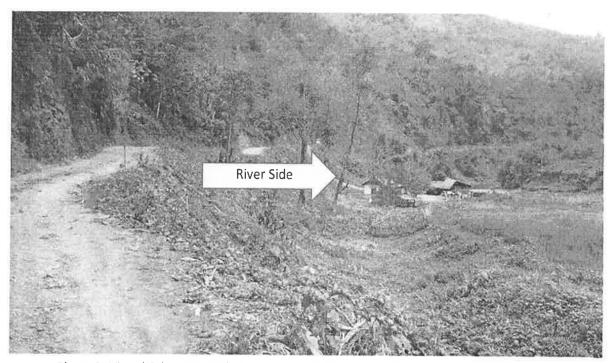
View (@ km 73+440) of project road alignment adjacent to Irang River Bank
